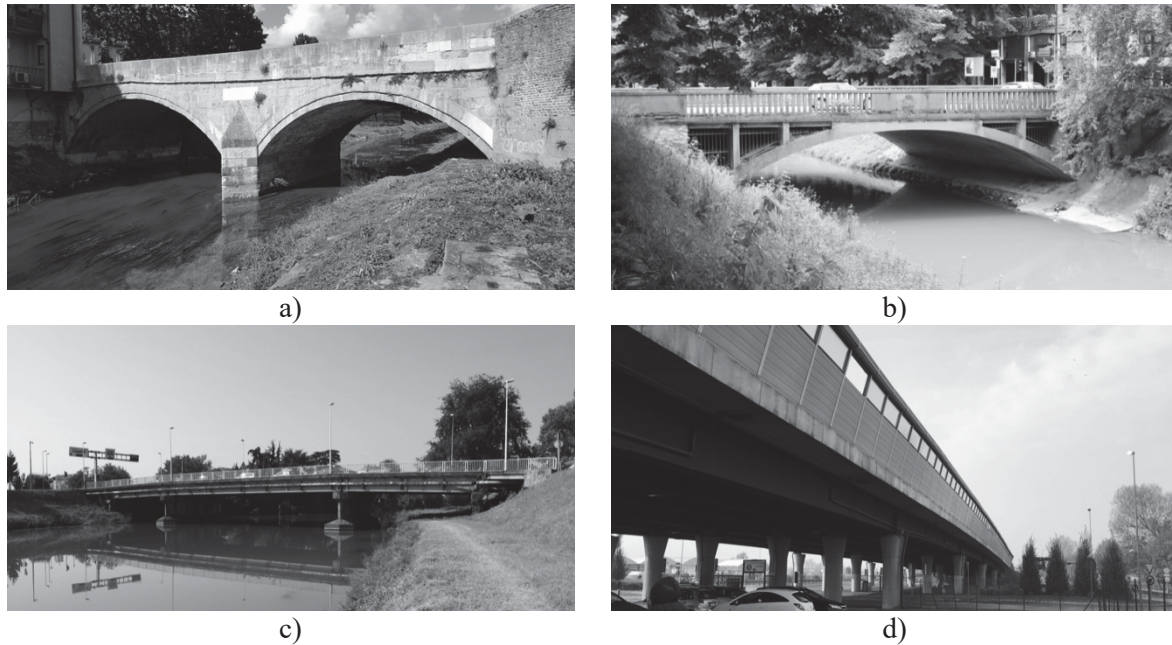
Examples of types of bridges of Padova inventory: a) masonry arch; b) r.c. arch; c) r.c. girder deck; and d) mixed steel-r.c. girder deck.
